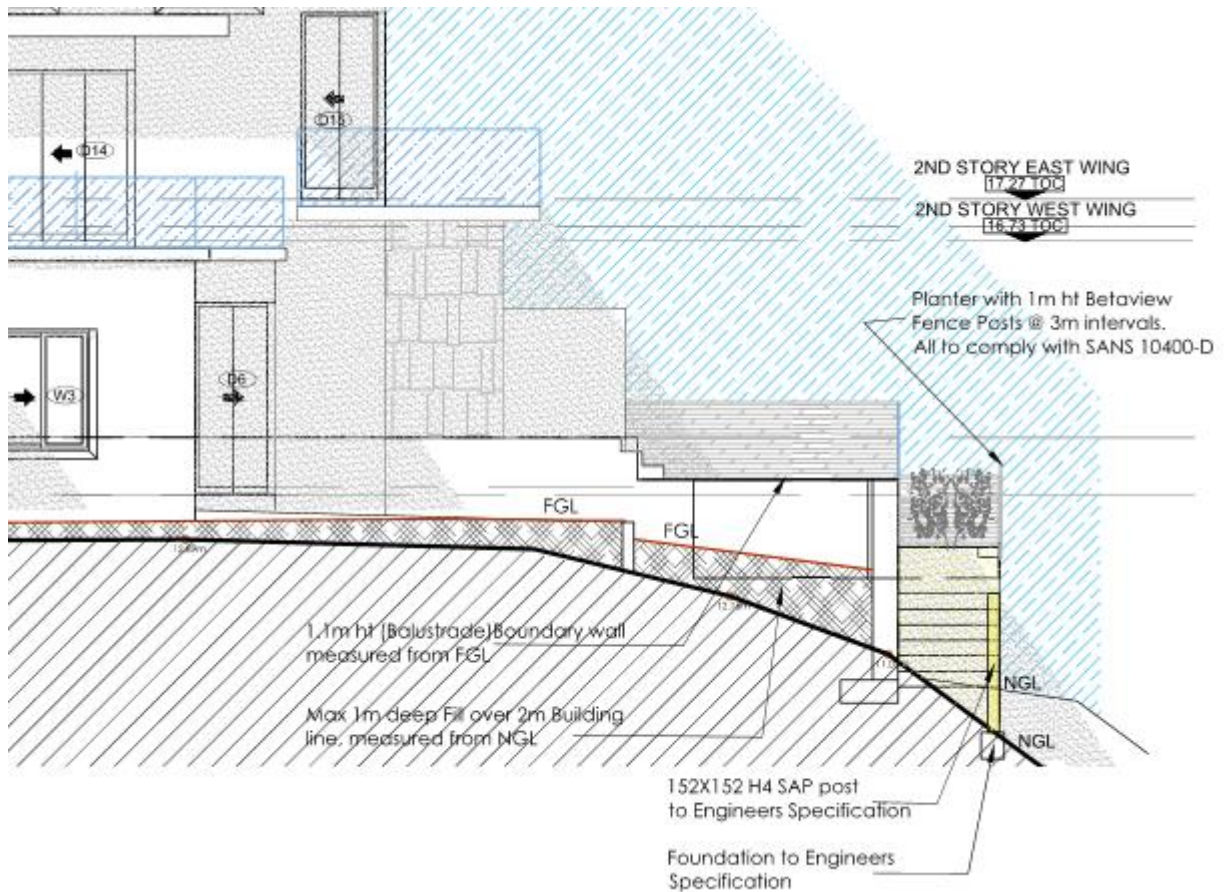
West elevation of retaining wall, canter lever planter & balustrade
